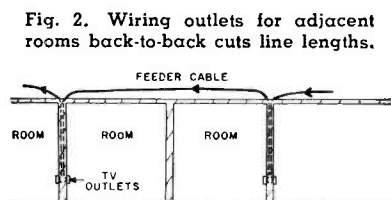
Wiring outlets for adjacent rooms back-to-back cuts line lengths.
